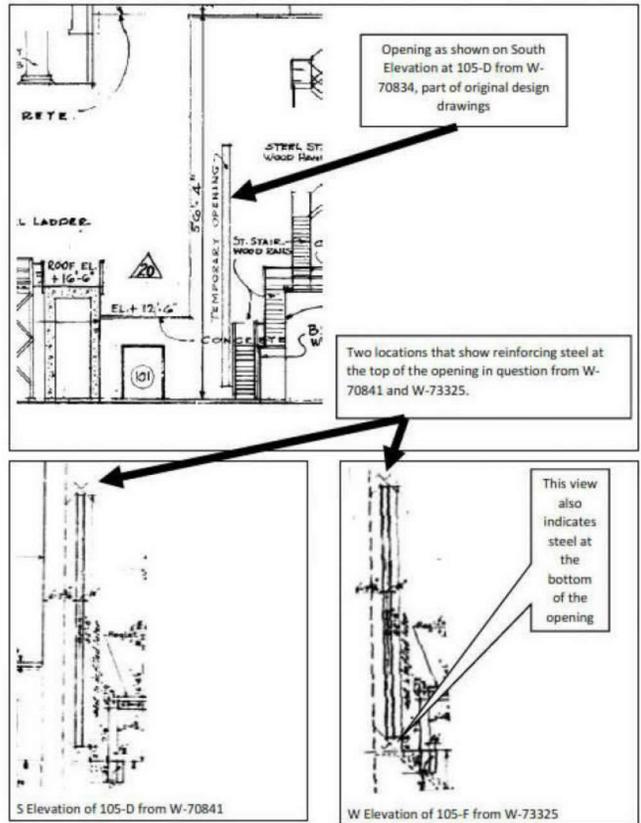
Selected Drawing Sections w/ Steel at Shield Wall Opening
